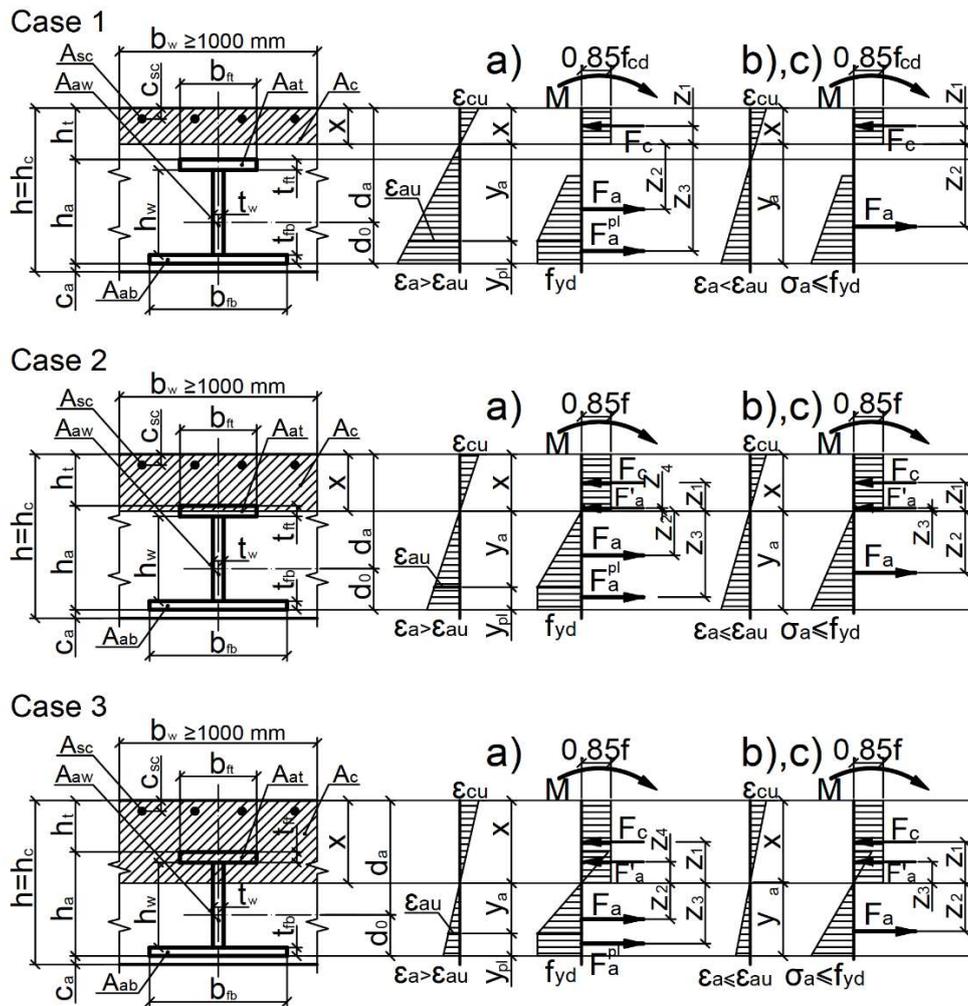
Limiting states of the equivalent cross-section of a slab steel-reinforced concrete structure when determining the bending strength
